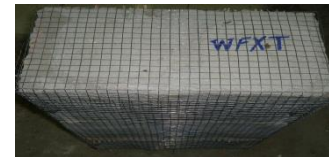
Steel wire meshes after formed into cages and enwrapped around walls specimens.
